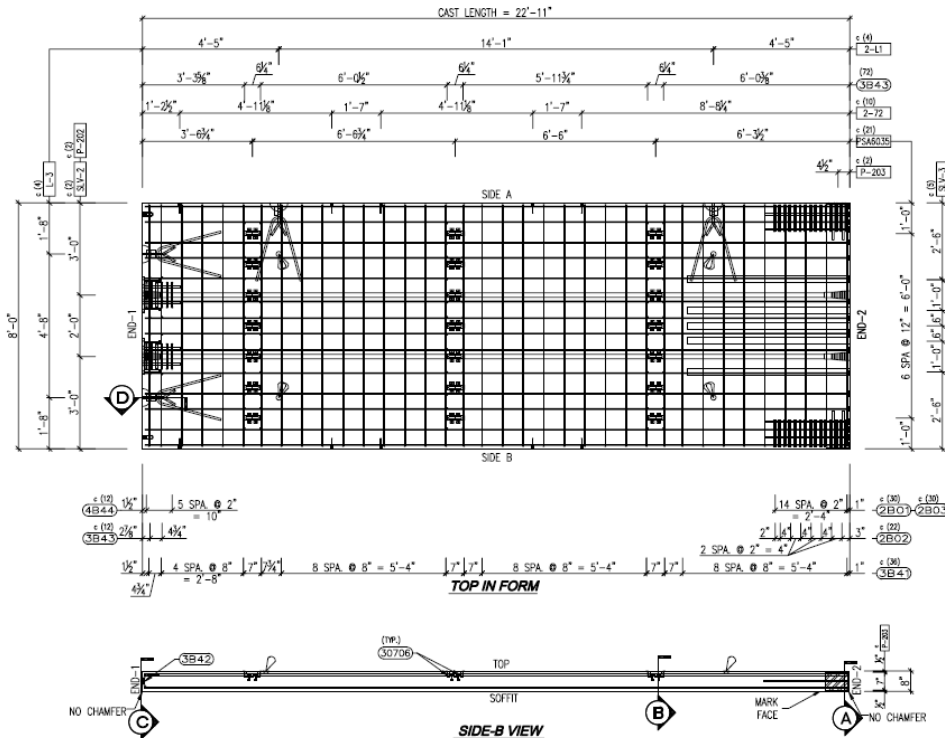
Unbonded post-tensioned precast rocking wall.
